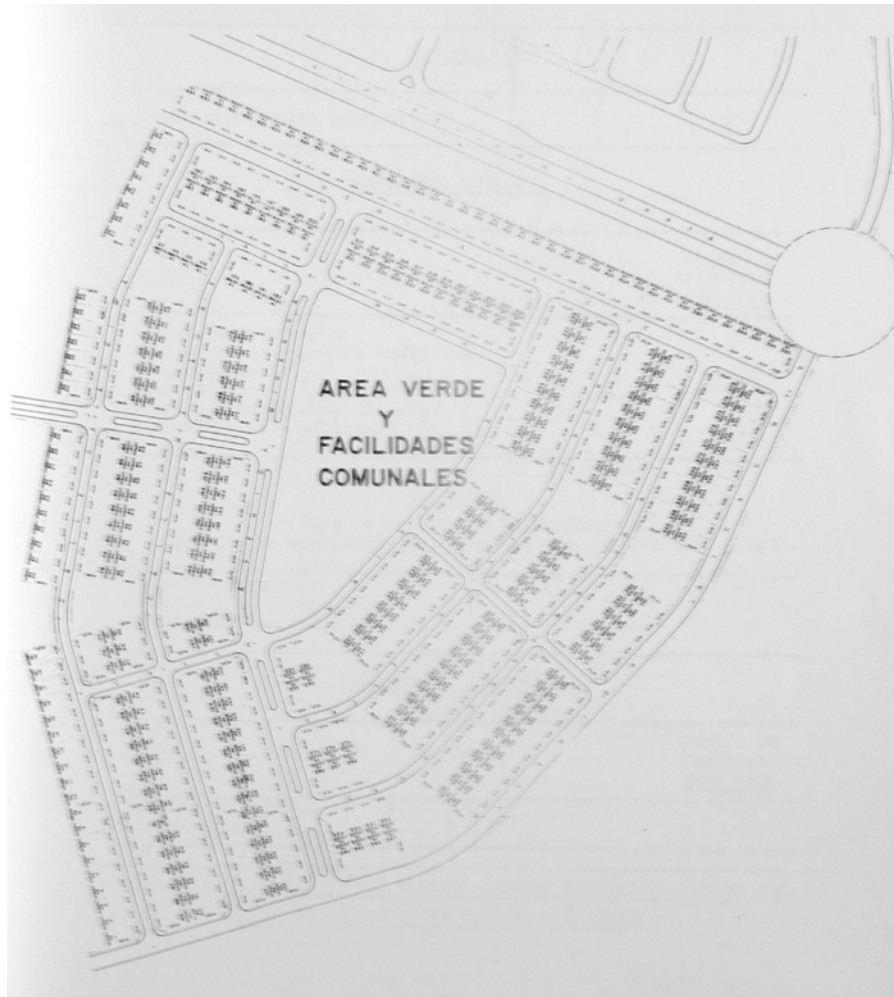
Layout plan of El Gallo (Source: Silva, 1967: 32)
